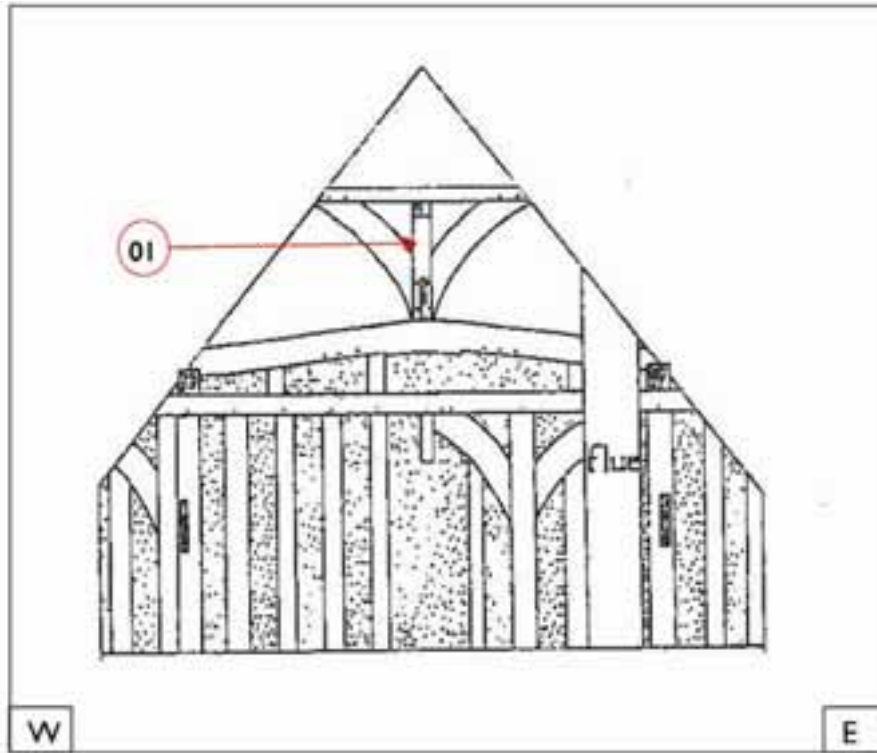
Hall range truss A showing sample location viewed from the south looking north (based on a drawing by M W Barley 1975)
